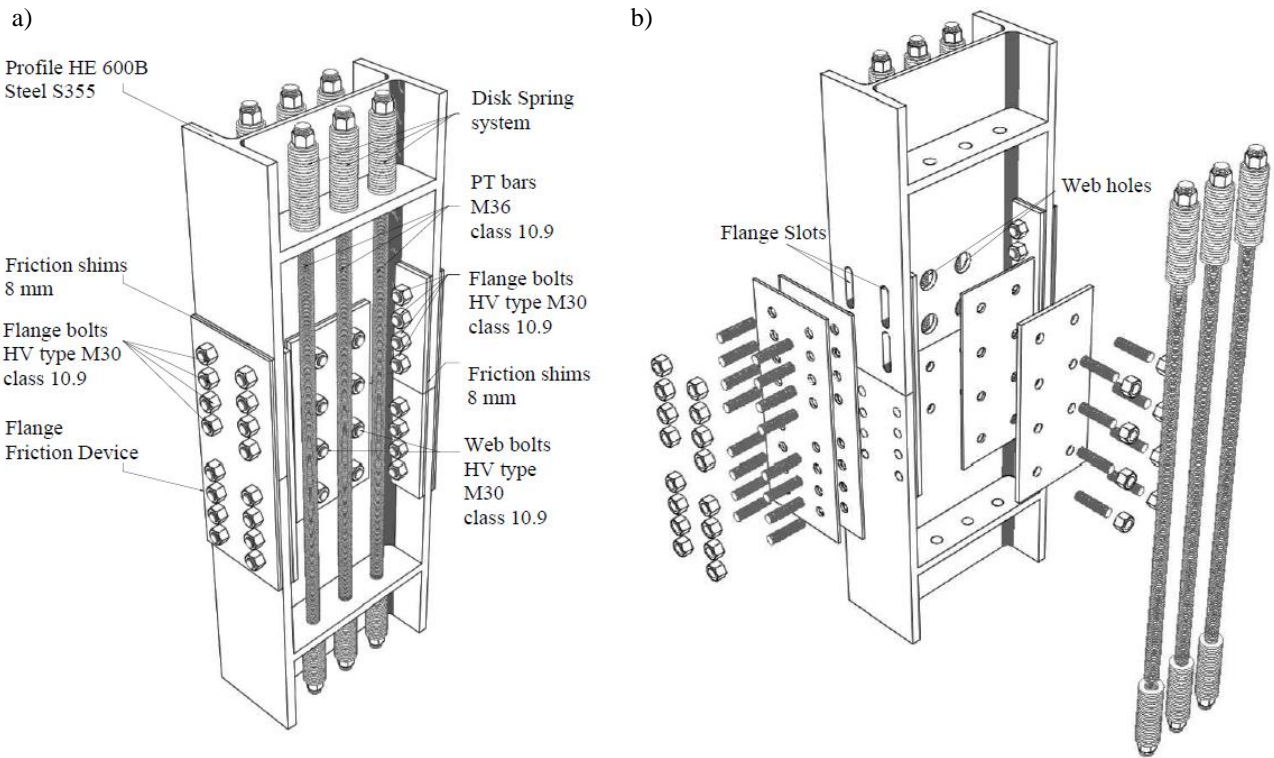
Structural details of the proposed column base connection: (a) 3D view; (b) Exploded 3D view.
